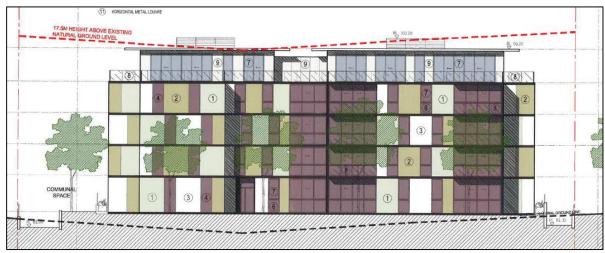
Extract of Elevation Plan of No. 22-26B Essex Street, Epping (2015SYW188)
